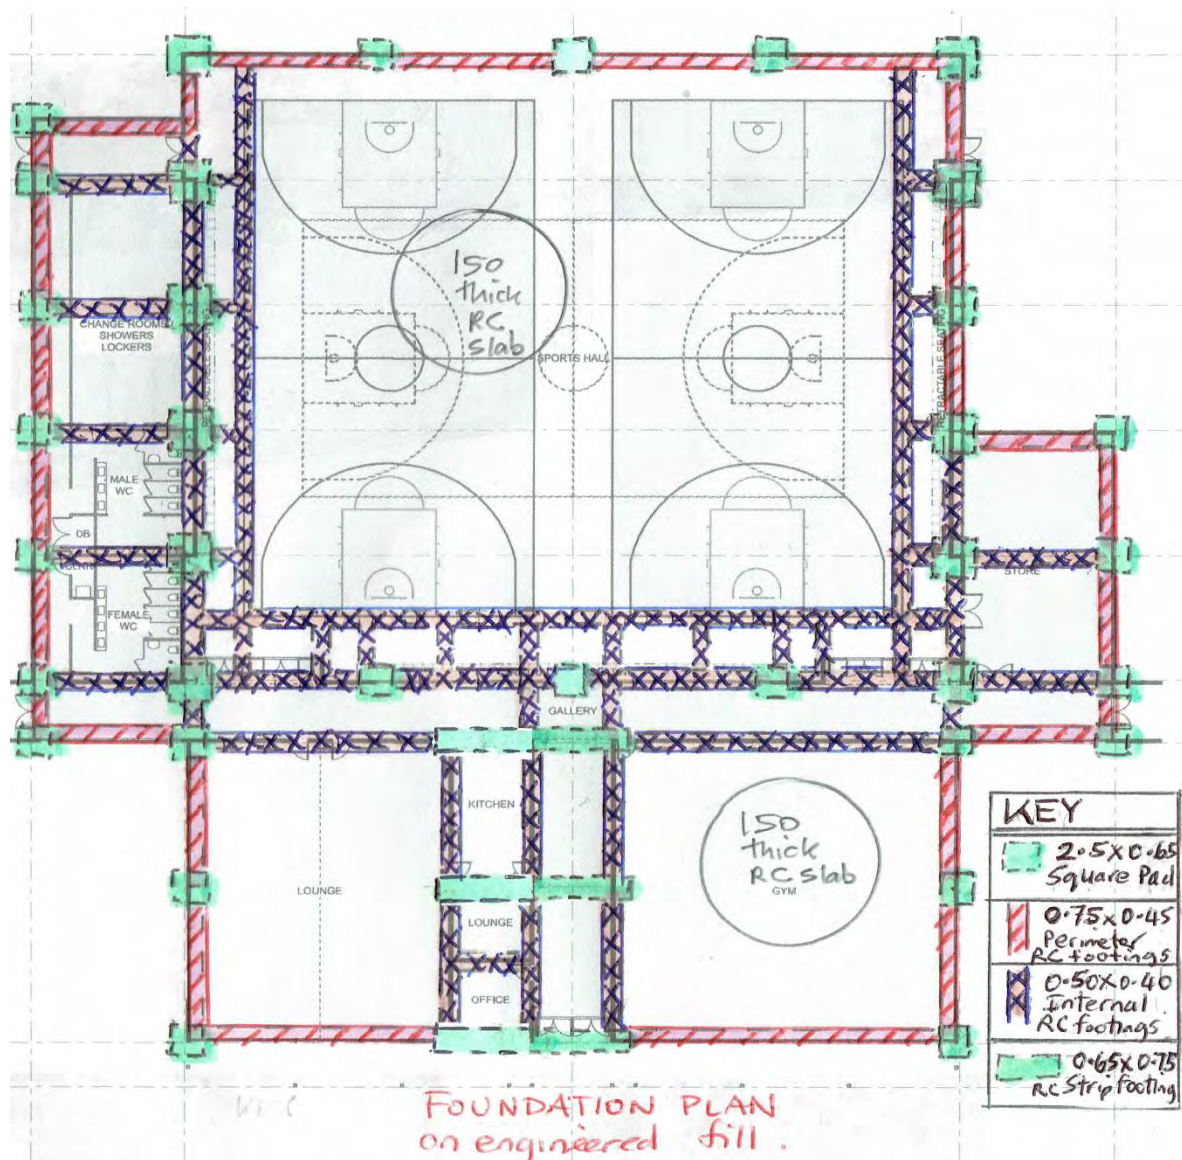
HB Architecture's Plan 1300 with overlaid Structural foundation system
